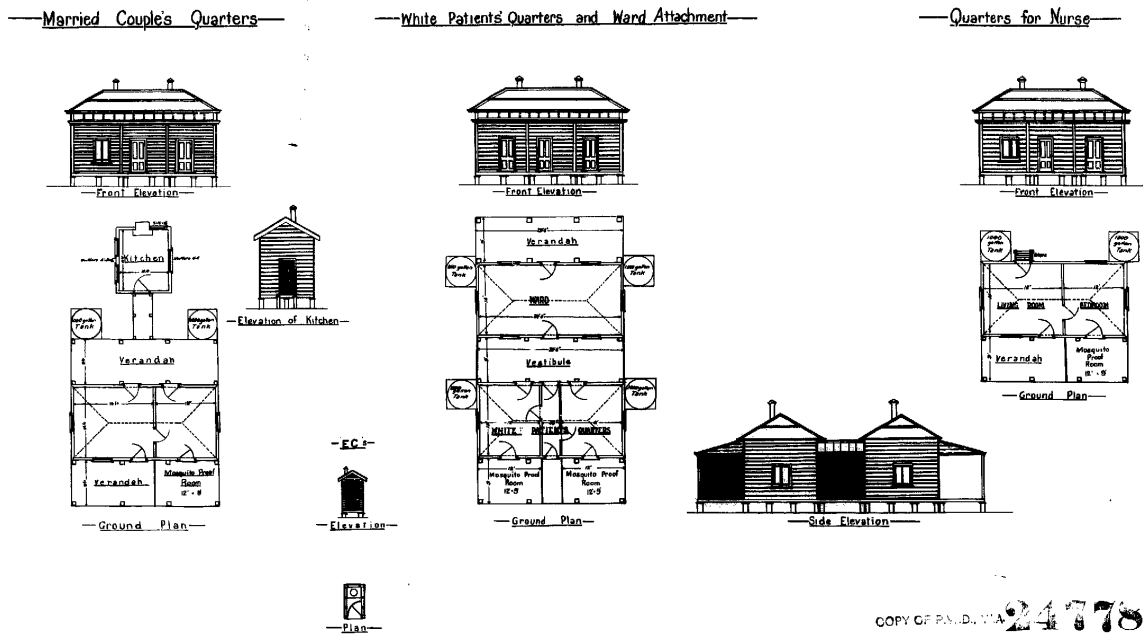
Cossack lazarette general arrangement of buildings (SRO Item 24778 Cons 1647).
